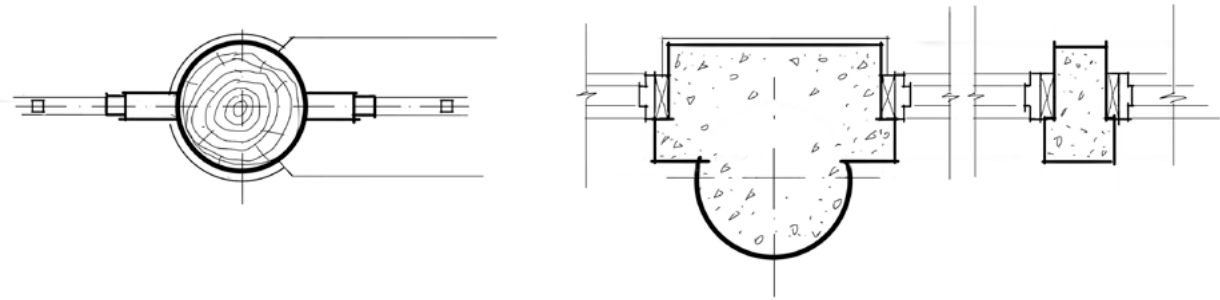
Comparison of real wood columns in traditional Chinese construction versus engaged columns in Murphy's concrete wall assembly (Drawing by the author after Sicheng Liang, *Qingshi Yingao Zeli*, and Murphy's Junior College building in Yenching)
